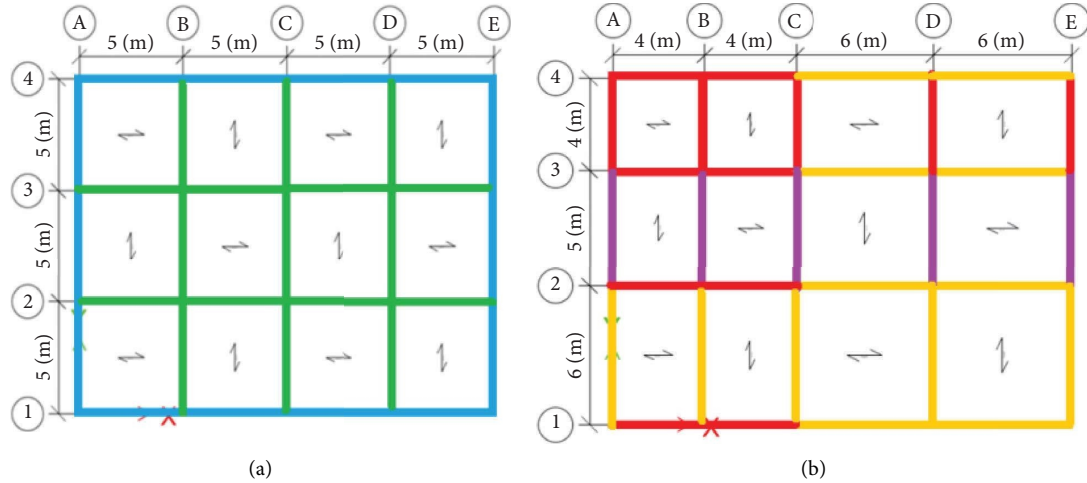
The typical story plan of the Model: (a) structure with a regular plan; (b) structure with an irregular plan.
